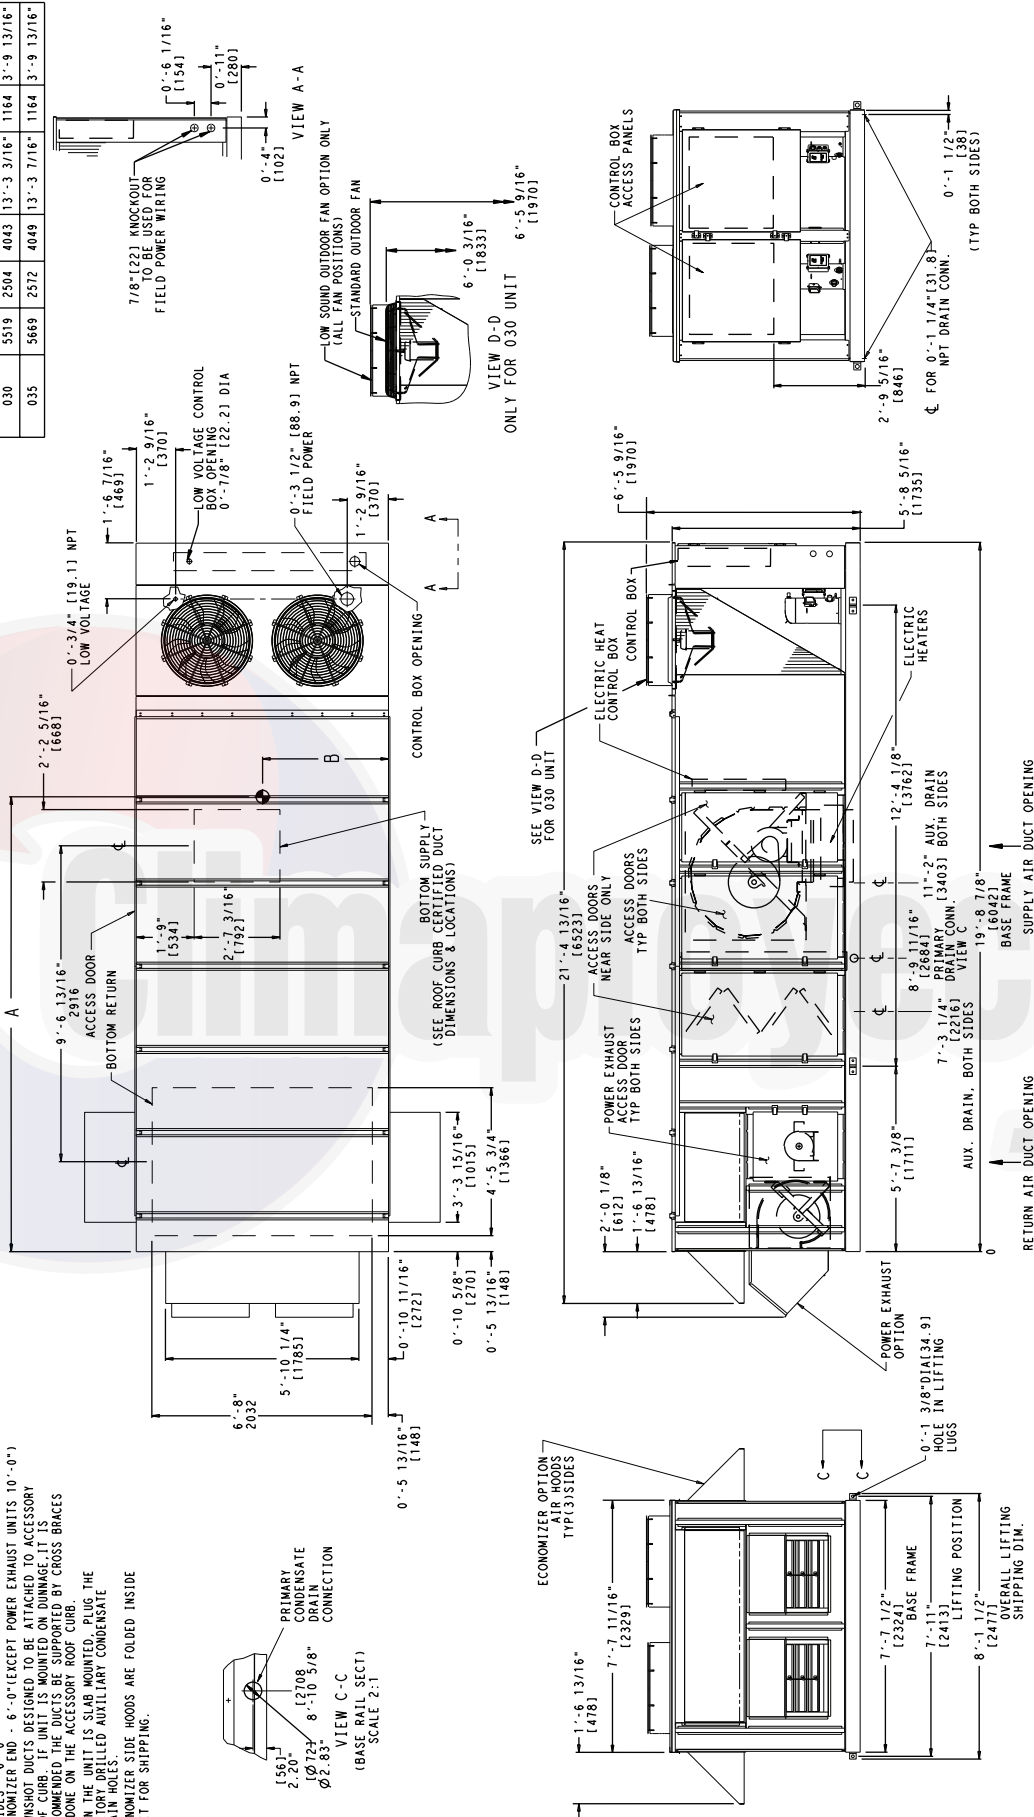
Base Unit Dimensional Drawing — 50P2,P3,P6,P7030,035 (Standard Chassis Unit Shown)
